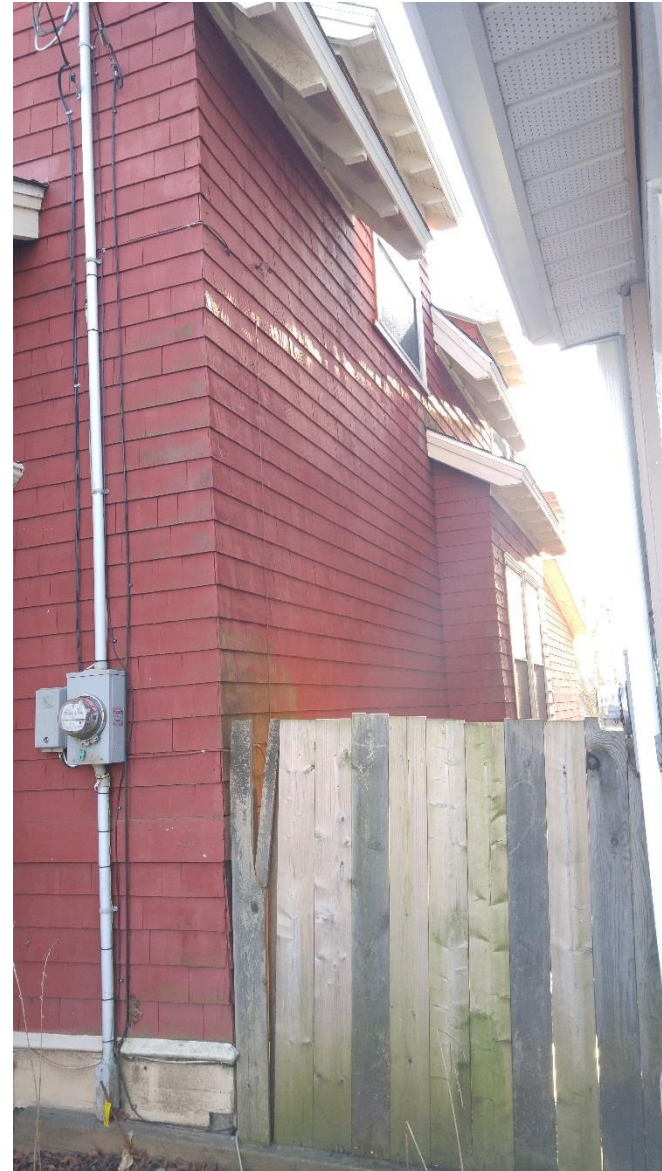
West elevation showing the stringcourse and jack rafters beneath the overhanging eaves
